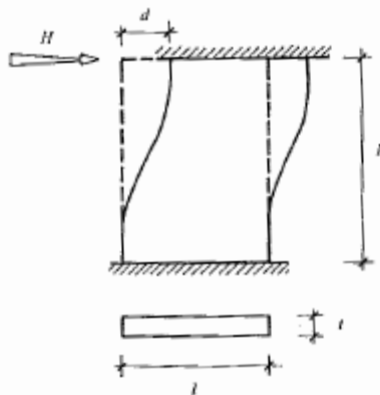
Deformation of a fixed-ended wall subjected to lateral loading.
